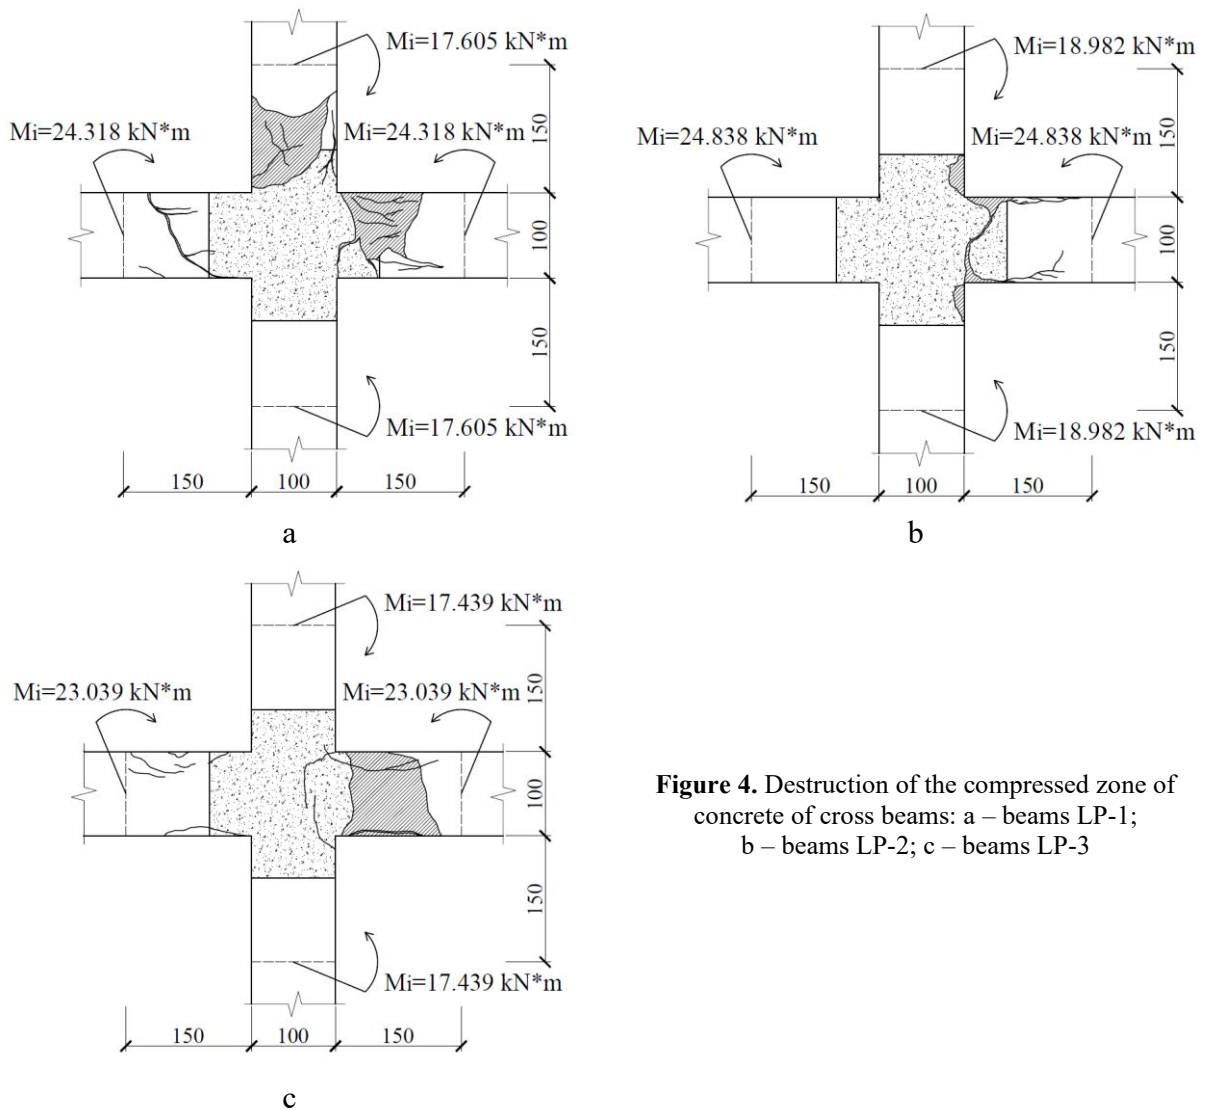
Destruction of the compressed zone of concrete of cross beams: a – beams LP-1; b – beams LP-2; c – beams LP-3
